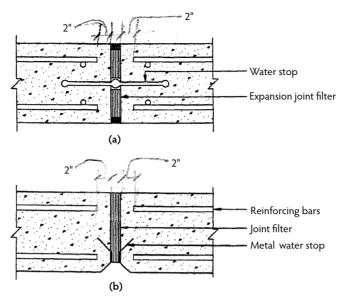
Expansion joint details: (a) liquid-retaining structures, (b) non-liquid-retaining structures. (From ACI Committee 224, *Joints in Concrete Construction*, ACI 224.3R-95, American Concrete Institute, Farmington Hills, MI, 1995, pp. 1–44; ACI Committee 302, *Guide for Concrete Floor and Slab Construction*, ACI 302.1R-89, American Concrete Institute, Farmington Hills, MI, 1989.)
